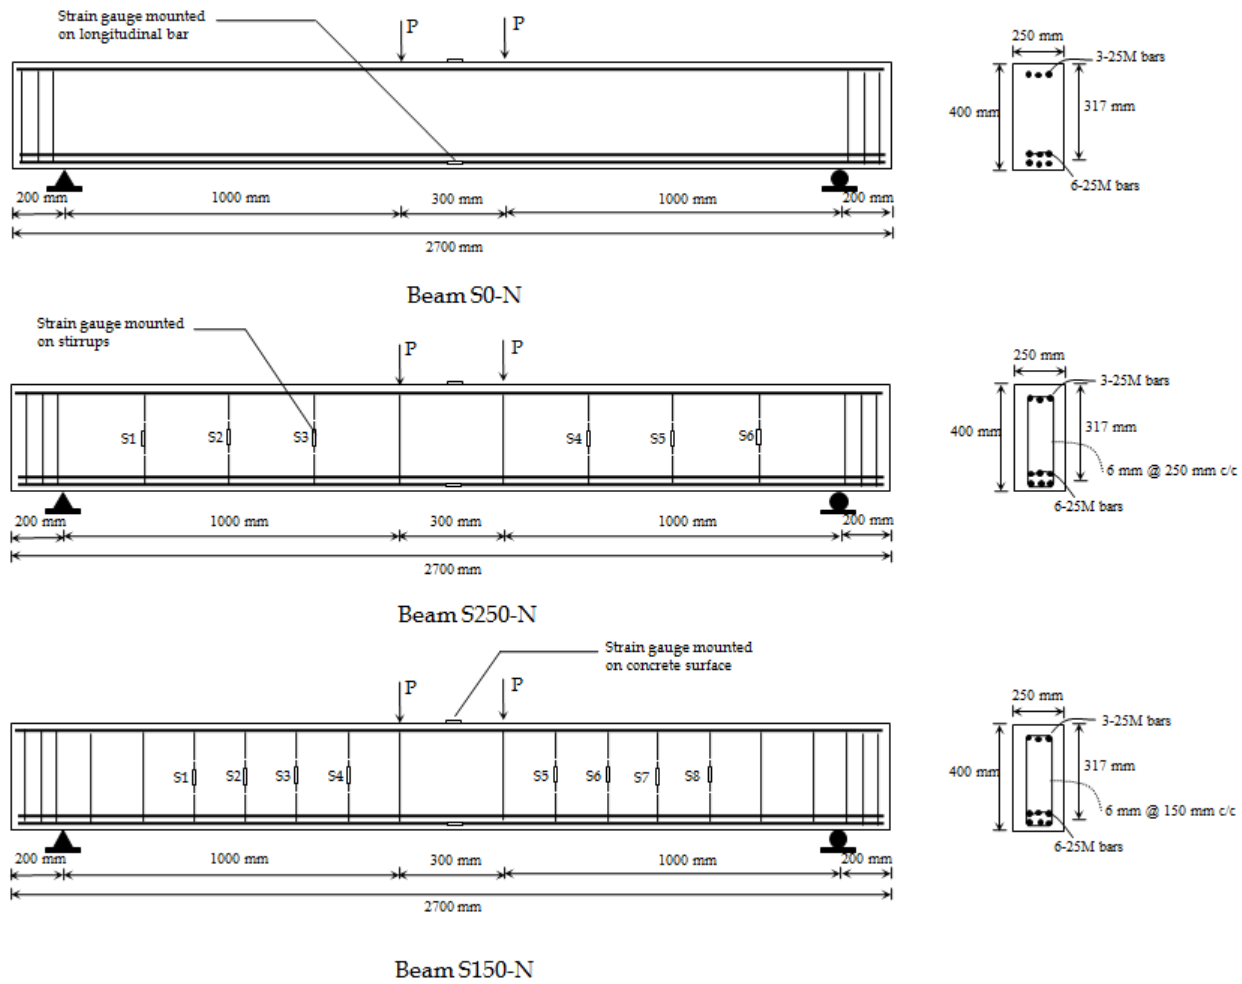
Beam geometry, reinforcement details and layout of strain gauges
